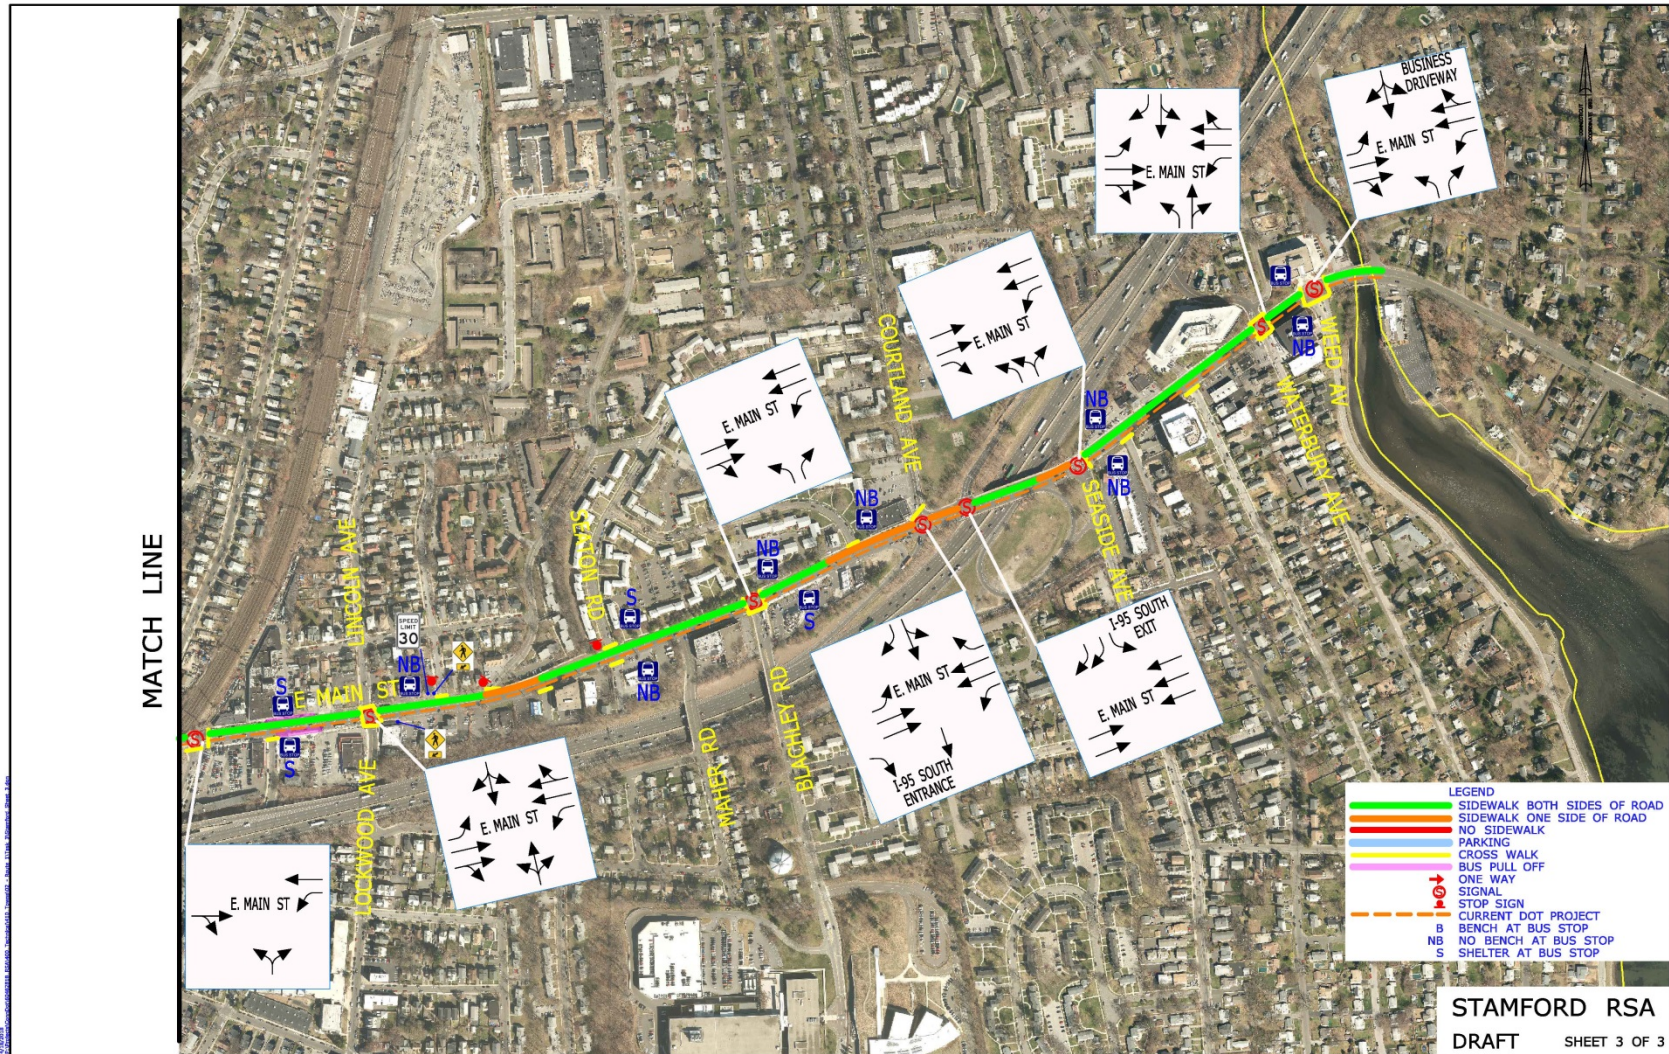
East Main Street, Stamford Route 1 - Road Geometrics
